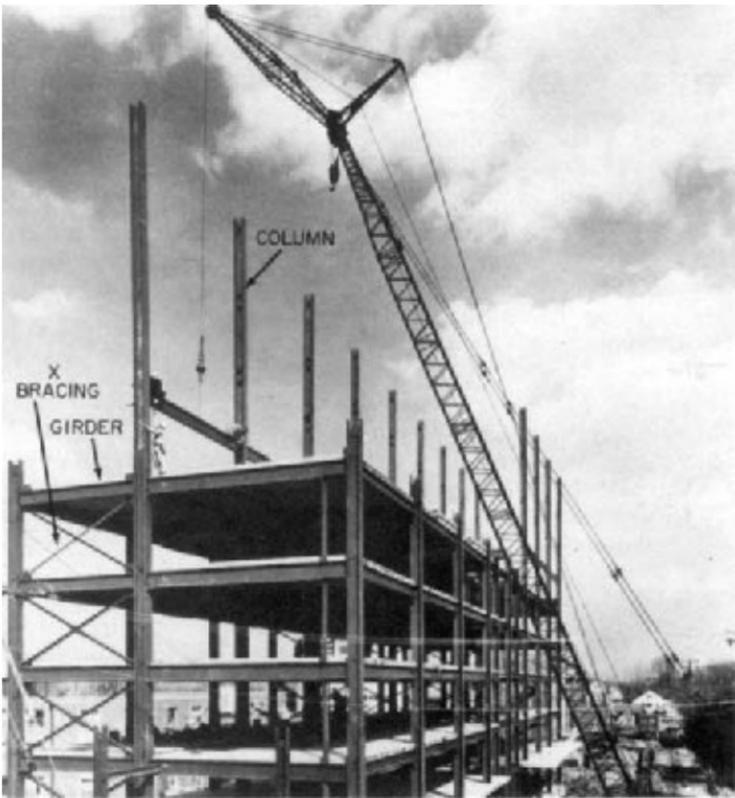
Structural-steel skeleton framing for a multistory building. (Courtesy of the American Institute of Steel Construction.)
